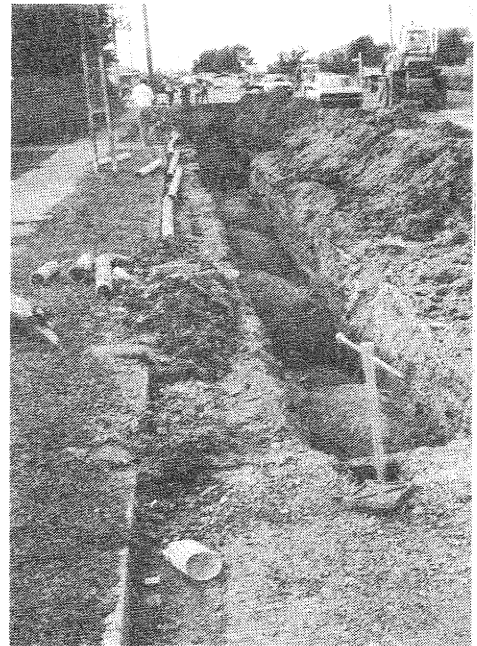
Relaying of extensively damaged water main
